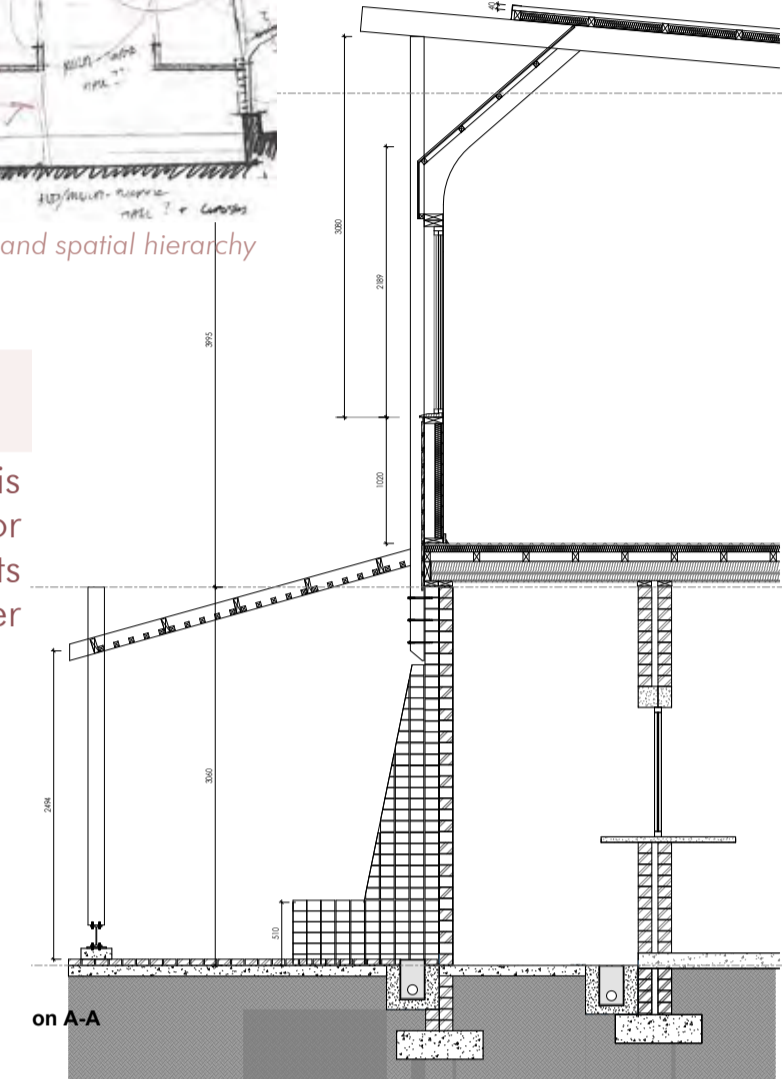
Developing the initial 1:20 edge section of the building (Author, 2023).
